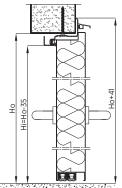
Installation of the ECO Tech single-leaf seamless door with a corner frame without a thermal break to a steel structure – vertical cross-section
